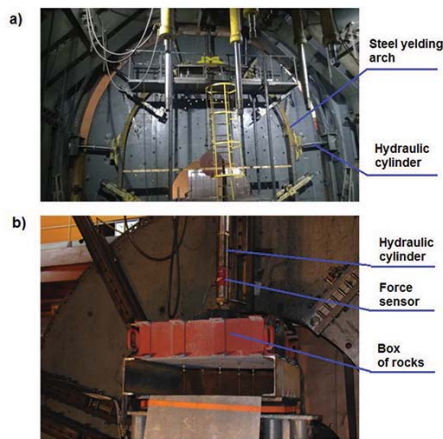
The test facilities at the Central Mining Institute (GIG). (a) Facility for testing steel arches at full scale, (b) facility for testing lining supports (e.g. shotcrete and TSL)
